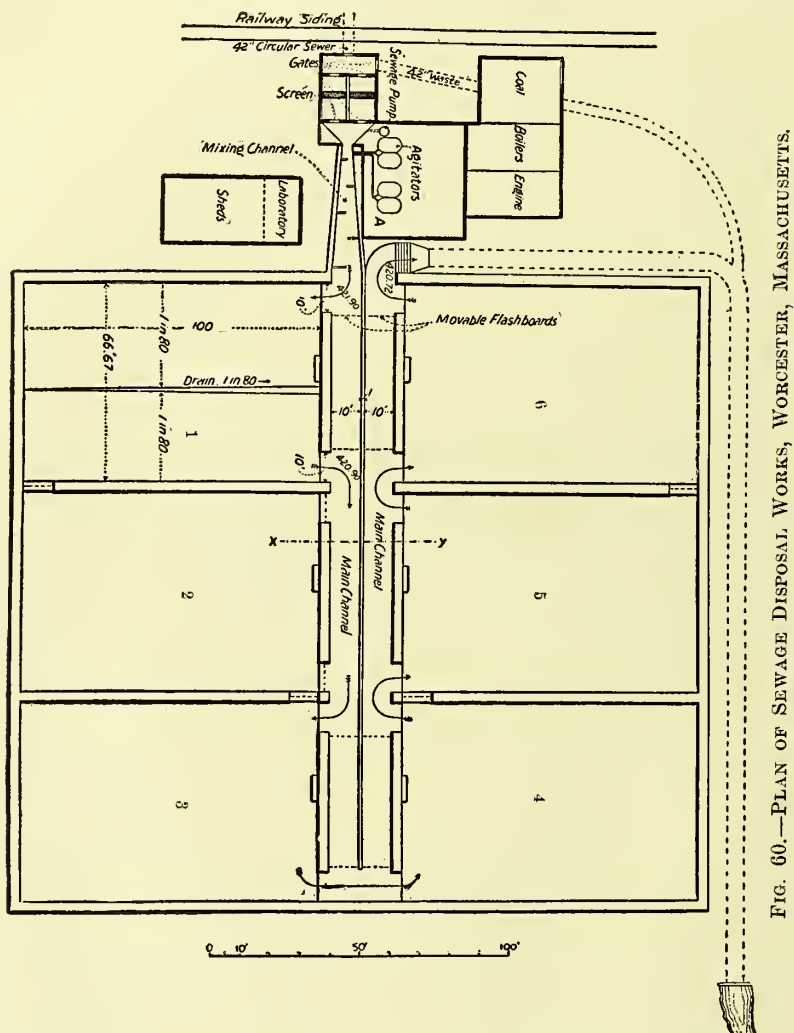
PLAN OF SEWAGE DISPOSAL WORKS, WORCESTER, MASSACHUSETTS.
